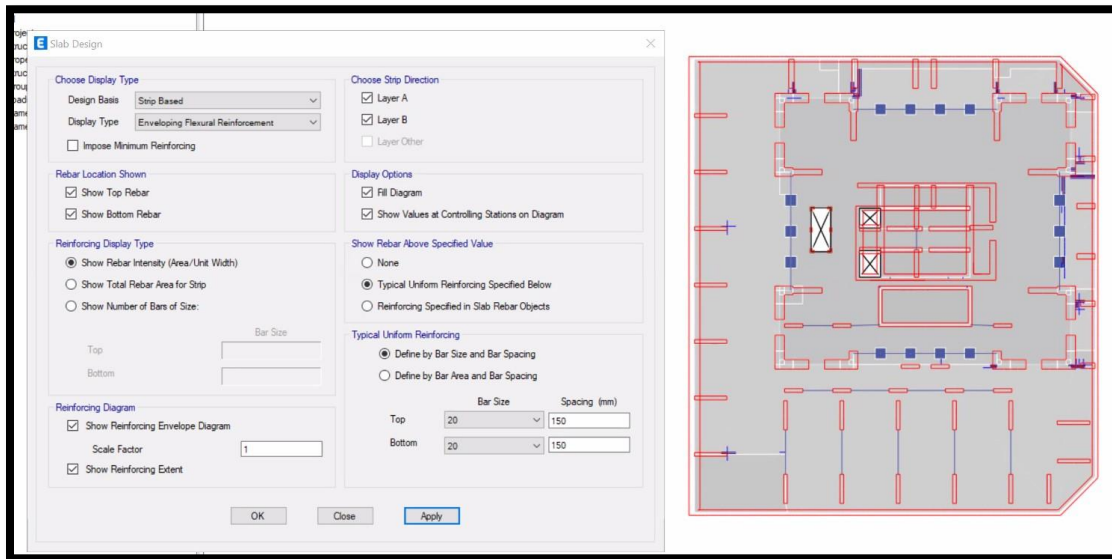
Core Reinforcement for Both Directions for 4th Basement Floor
